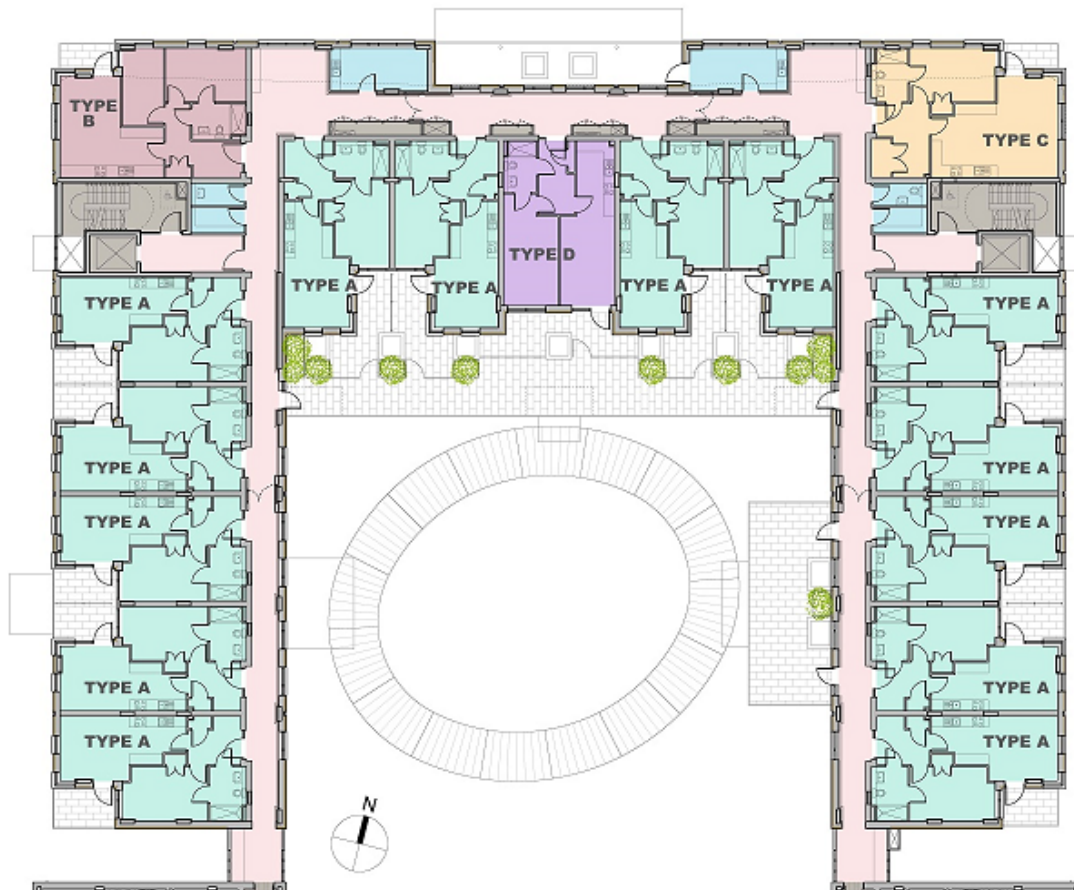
Example upper floor plan (first floor shown) with the four different residential unit types
